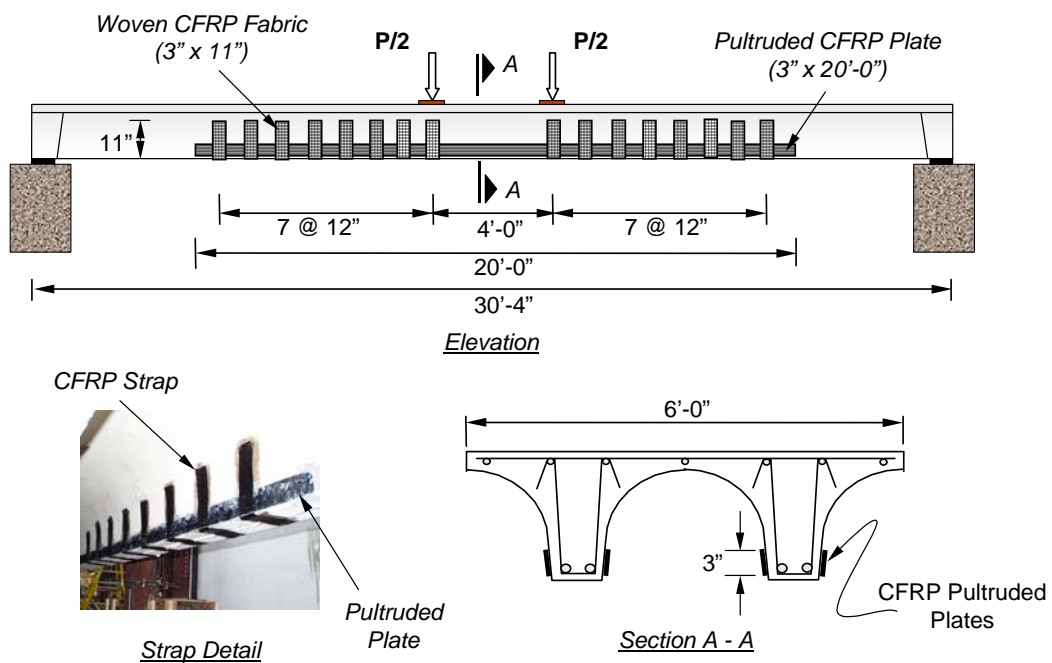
CFRP Strengthening Details for Specimen J-1
